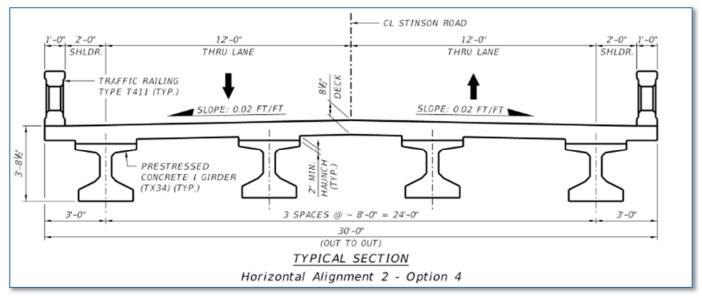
TxDOT Prestressed Concrete I-Girders (TX34) Typical Section
